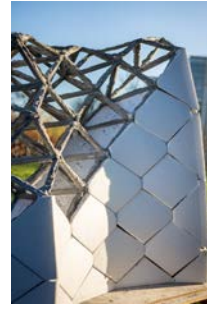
Curved concrete truss [11], Photo credit Stefano Borghi
